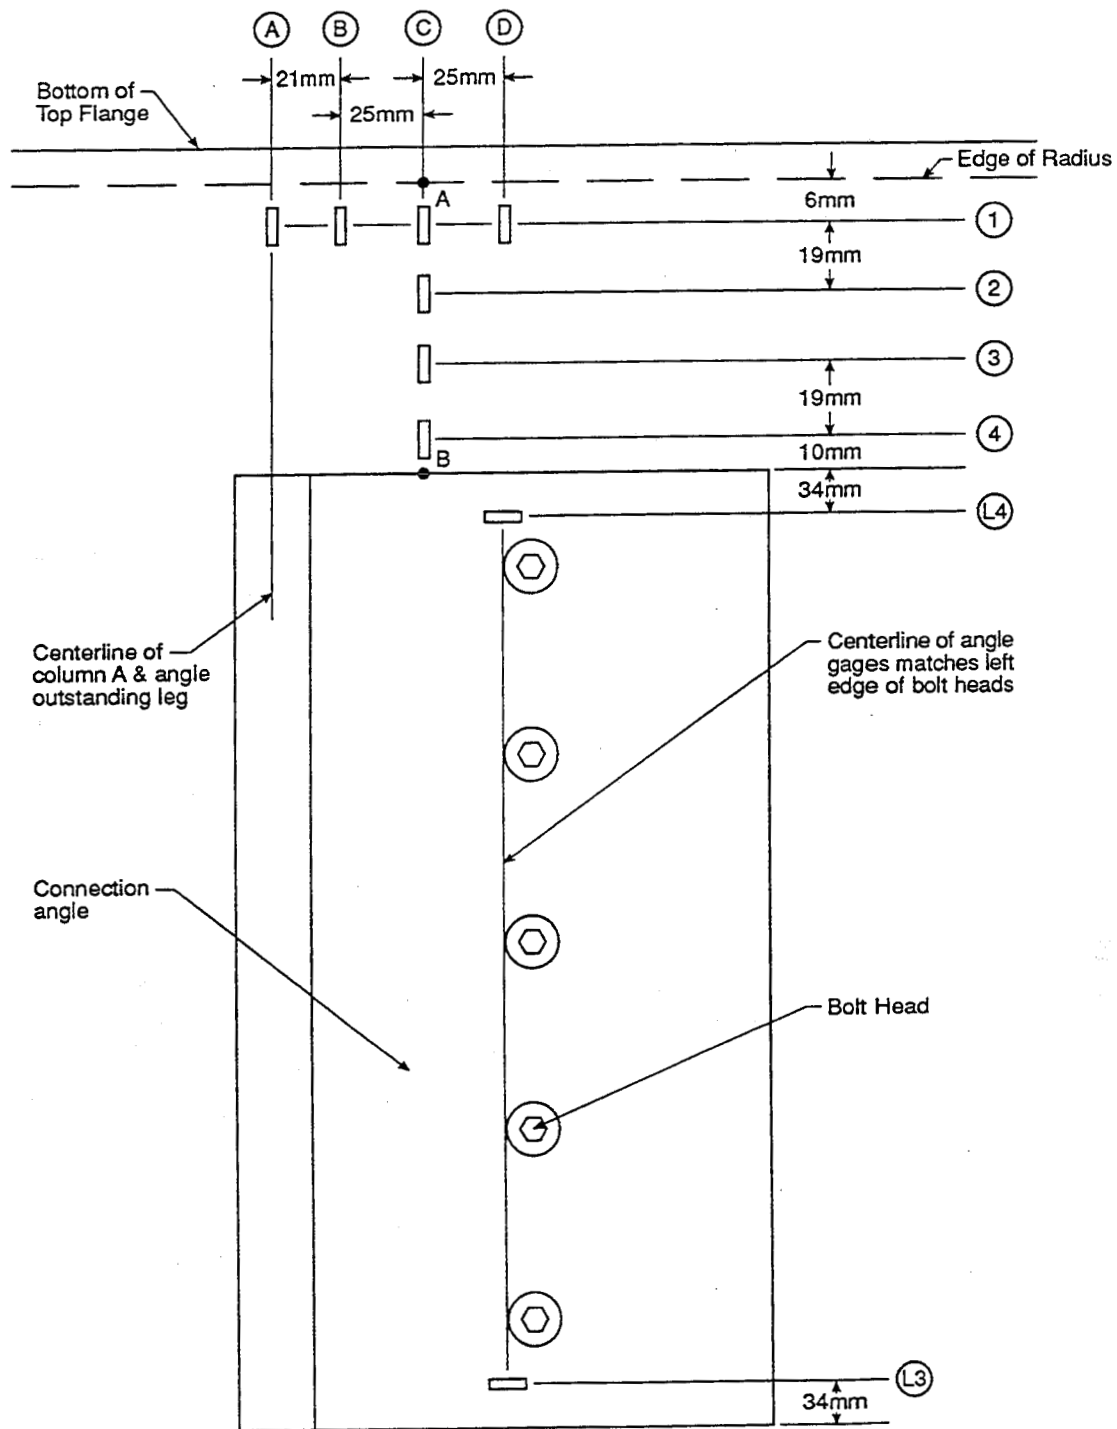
Web Gap Gage Positions for Type A Welded Plate Connection
